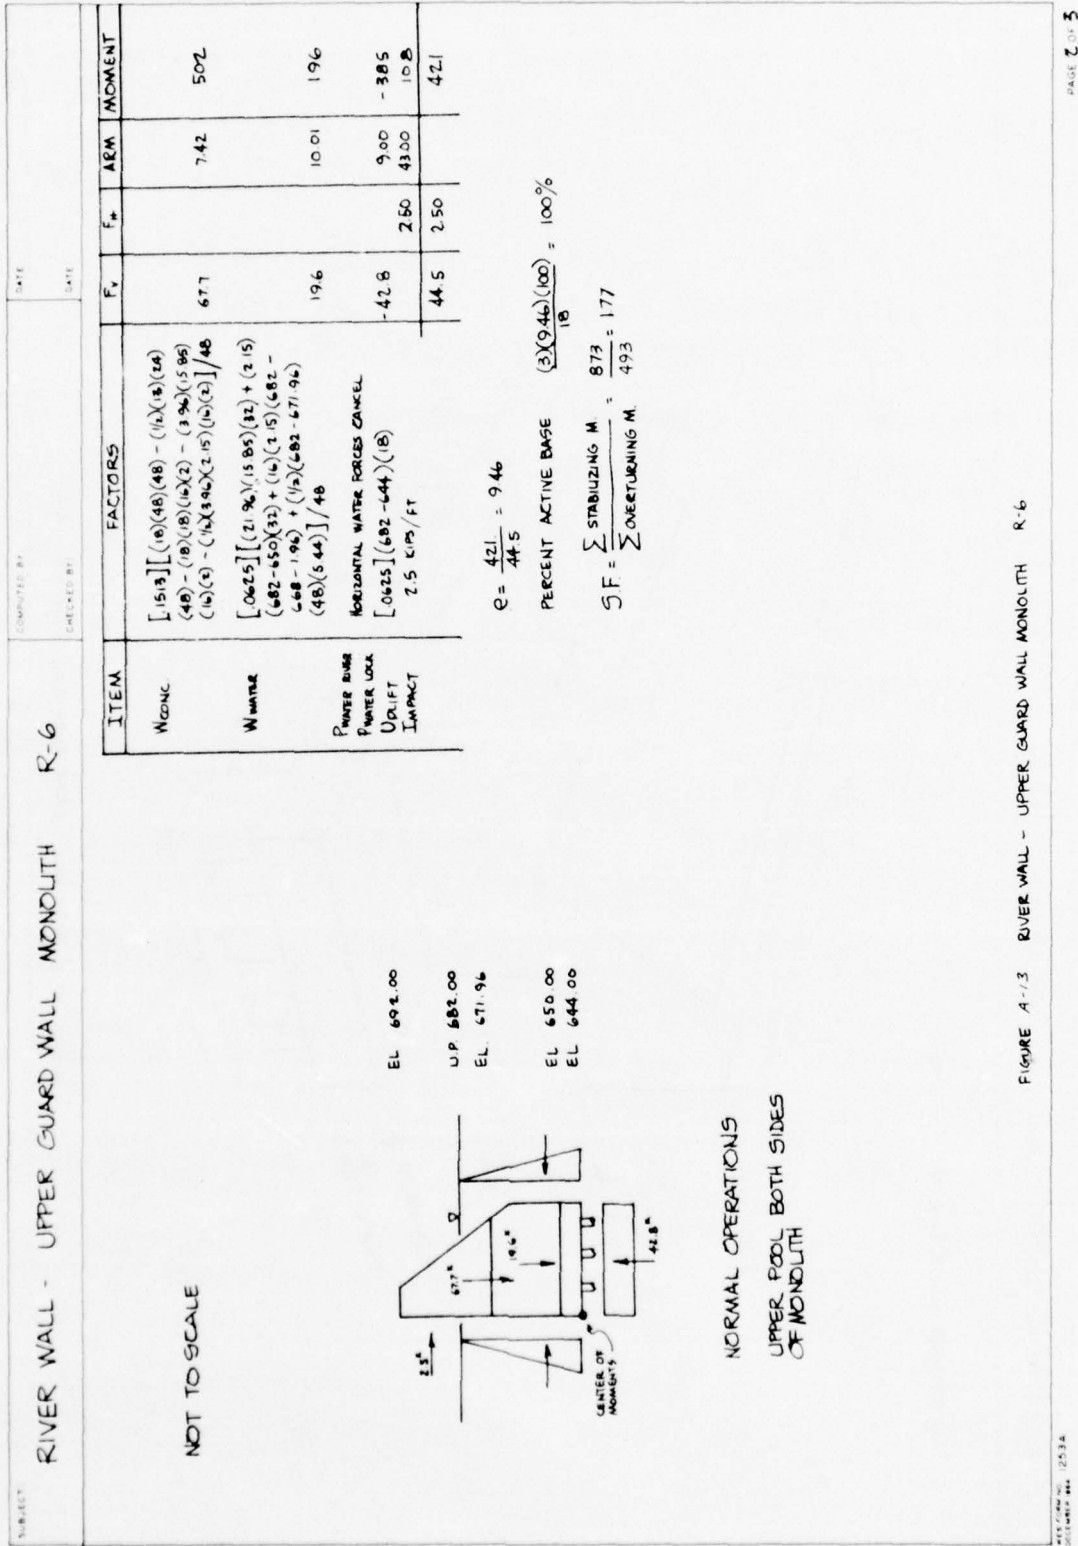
RIVER WALL - UPPER GUARD WALL MONOLITH R-6
